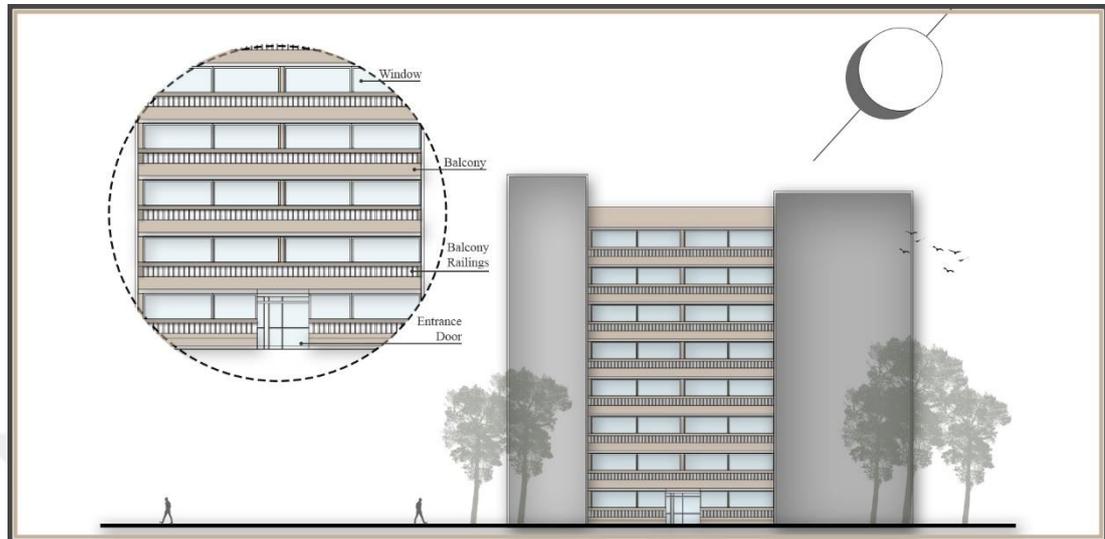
Illustration of facade as an architectural element. Drawn and produced by the author.
